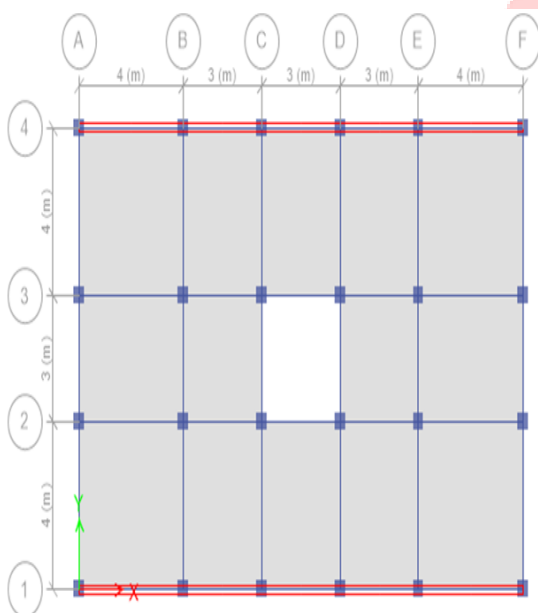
Plan view of the Structure with Shear Wall at X-Direction
